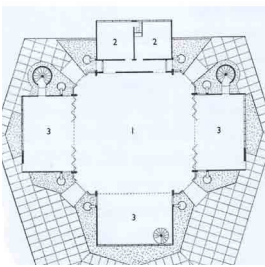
Plan drawing, the Greek cross plan divides the building into a central space and 4 secondary "arms" with independent entrances
